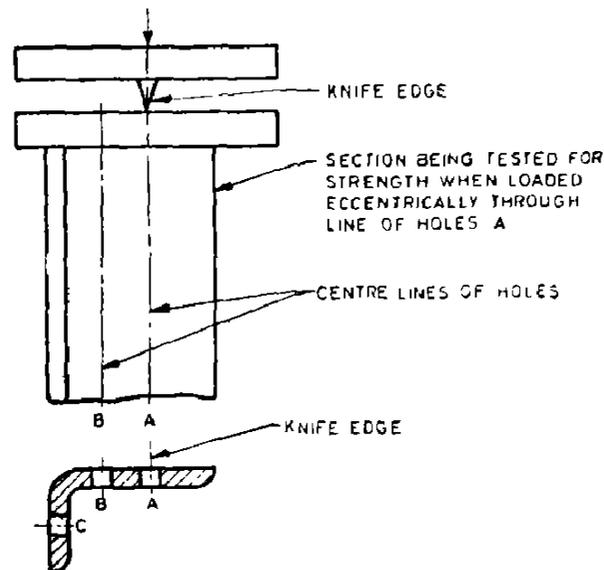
END CONDITIONS FOR ECCENTRIC STRUT TEST
